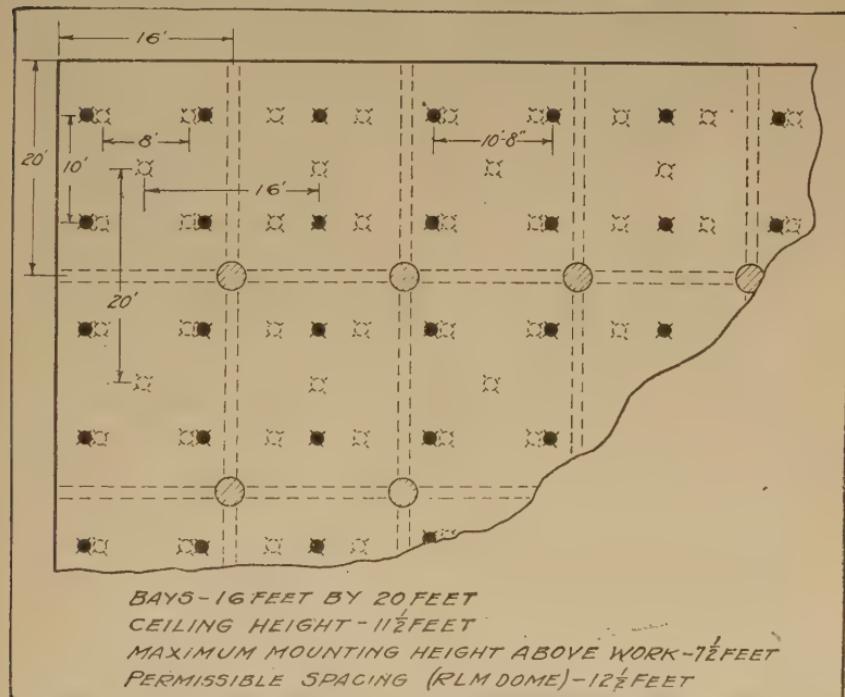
Suggested Location of Lighting Units for 16- by 20-Foot Bays with 11 1/4-Foot Ceilings
